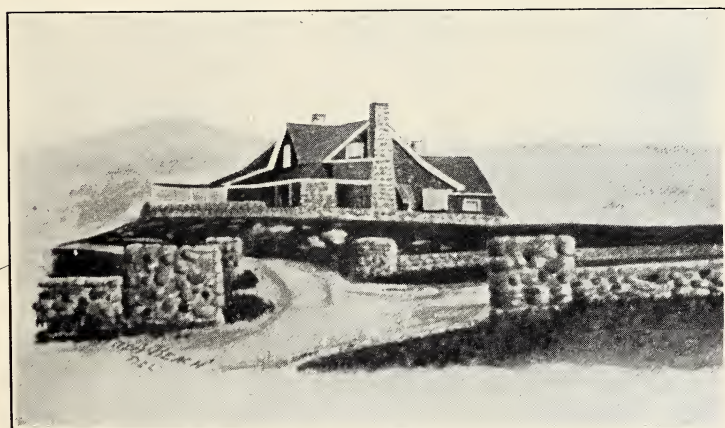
GROUNDS AND HOUSE BROUGHT INTO HARMONY BY INTRODUCTION OF STONE WALLS SIMILAR IN CONSTRUCTION TO STONWORK OF HOUSE.
